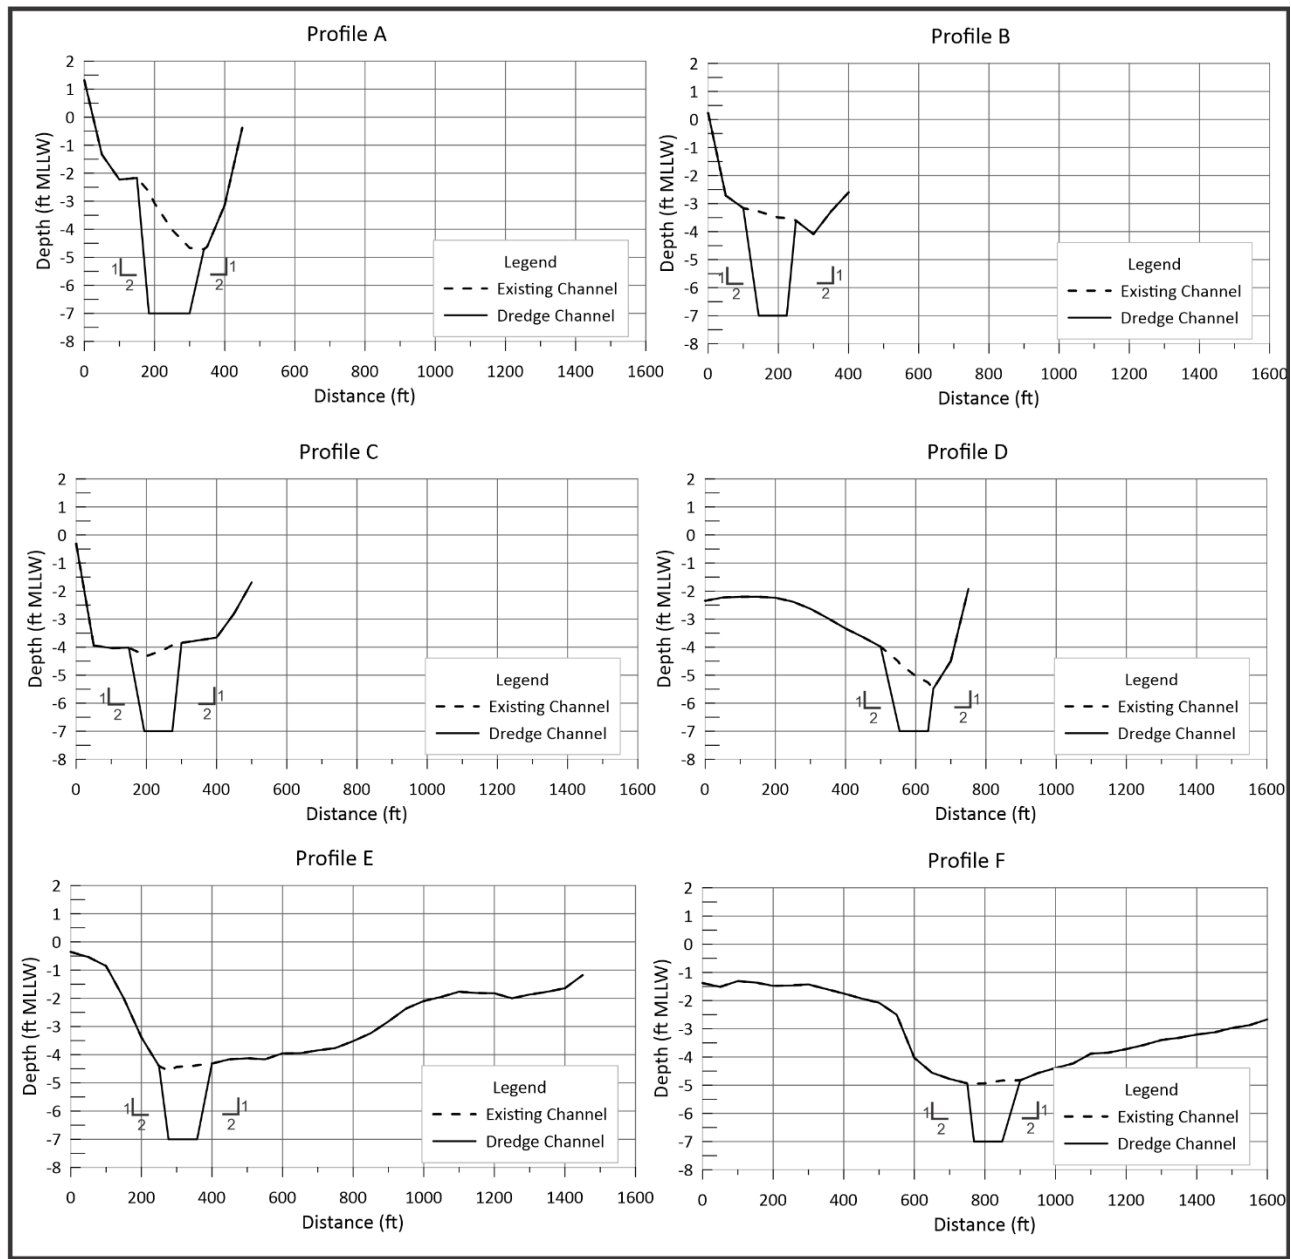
Typical channel cross-sections looking up-creek at Timberneck. Their location is shown on Figure 10.
